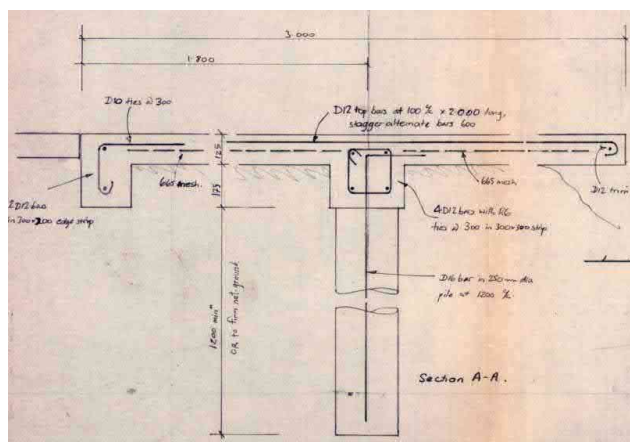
1978 garage floor and foundation details. The cantilevered portion of floor overhangs the southern portion of the slope where new retaining walls are proposed.
